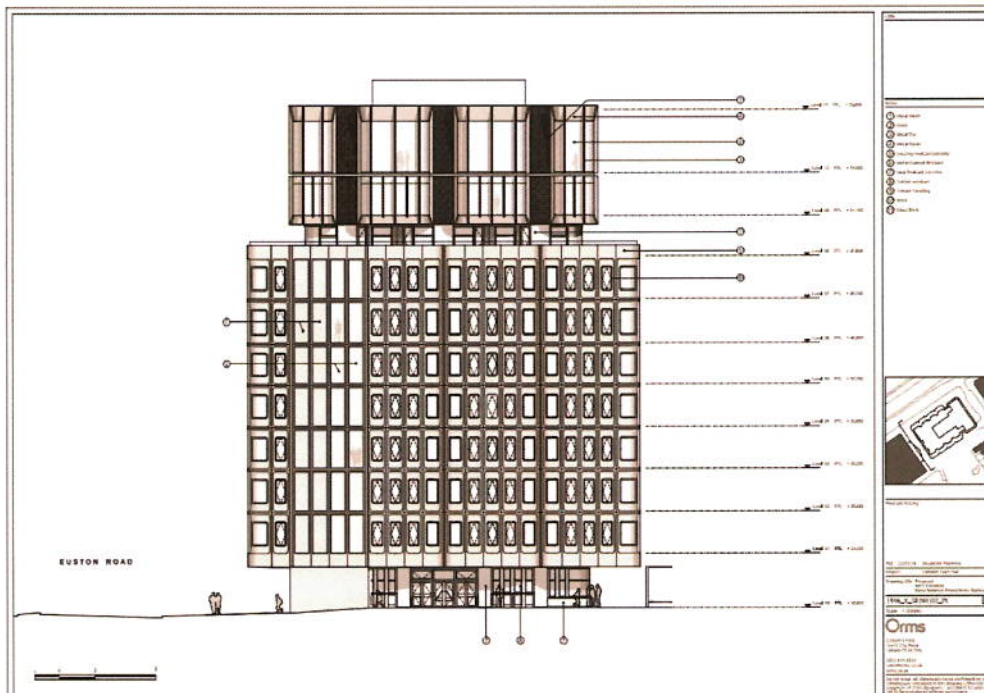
Approved Tonbridge Walk (West) elevation showing the hotel rooms (Ref: 2016/0410/P)
